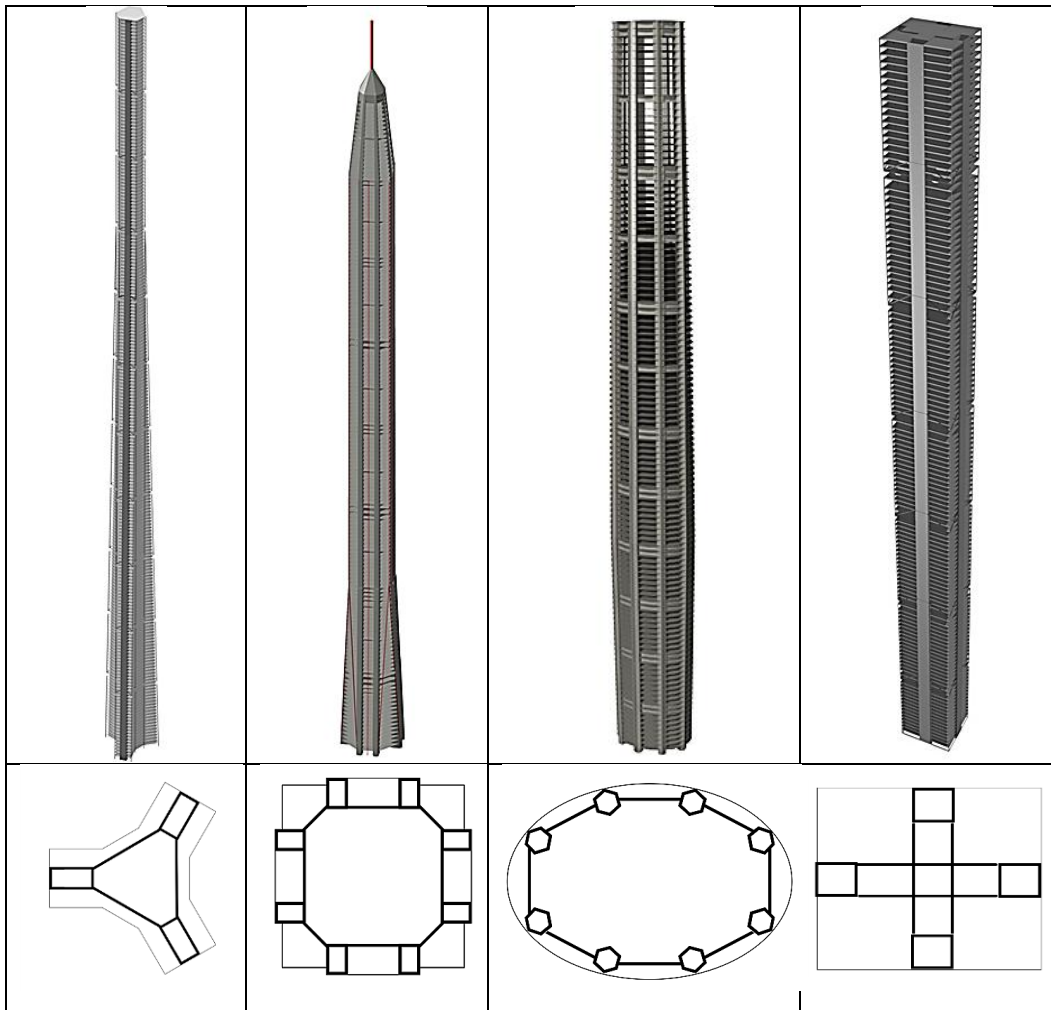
Different tube mega frame prototypes with their respective outrigger floor plans (Tyréns)
